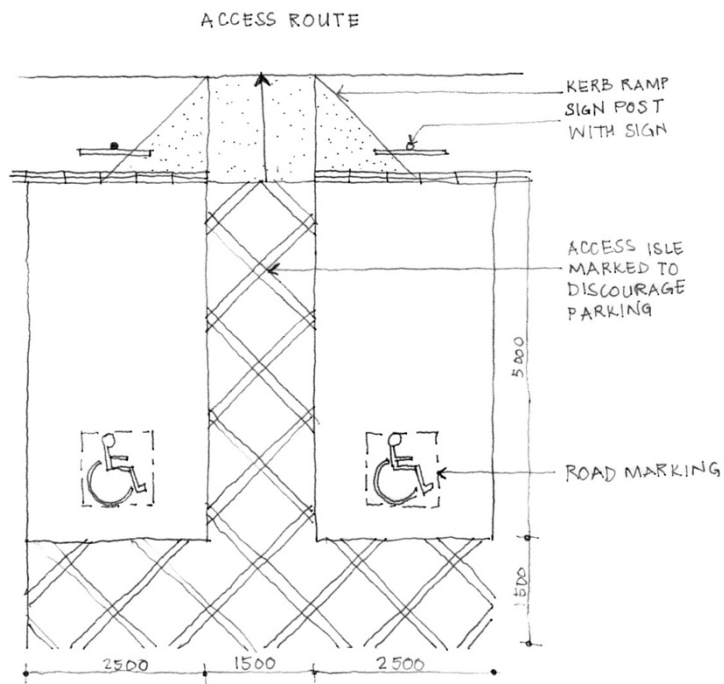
MINIMUM PARKING SPACE ALLOCATION
